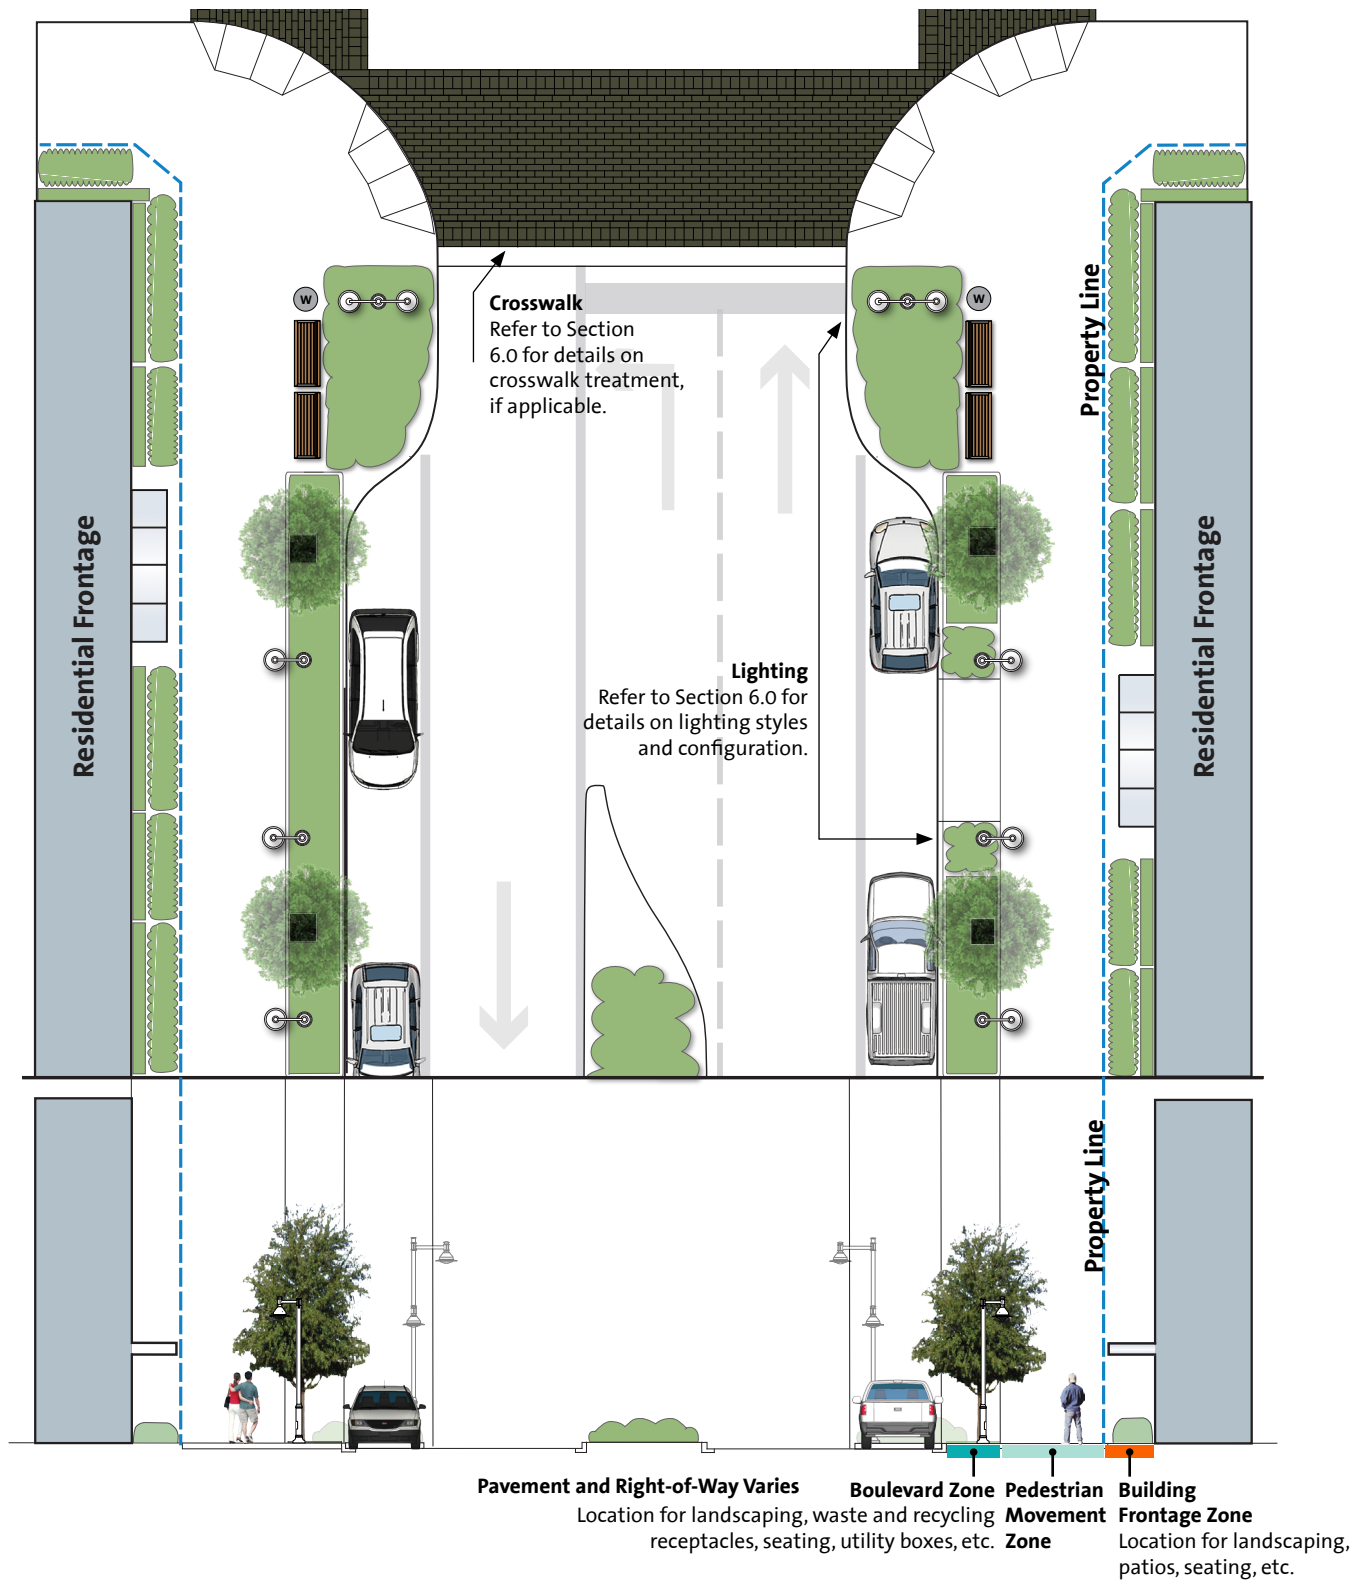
Plan View and Cross-Section of Residential Fronting Streets.
